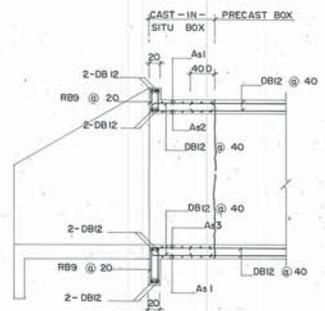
DETAILS FOR SKEW @ CAST-IN-SITU BOX
